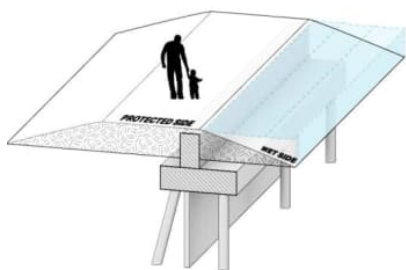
Buried Sheet Pile Floodwall, Mantoloking, NJ, Mott MacDonald
